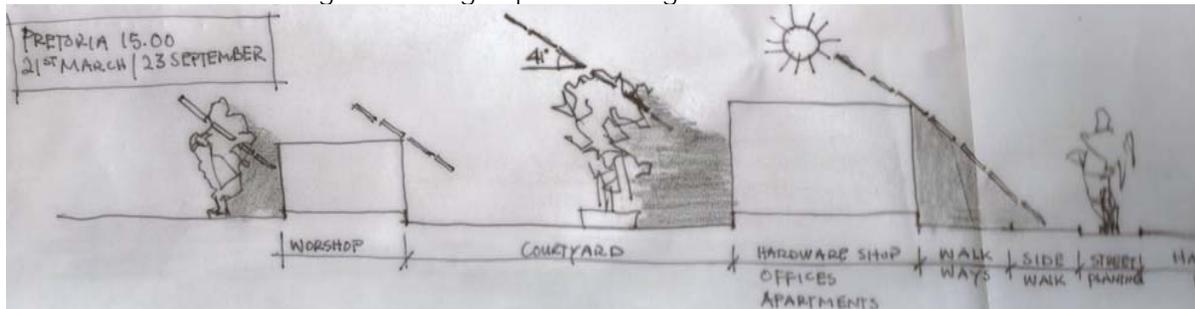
Conceptual West – East SECTION through the Centre. All walkways are shaded. The need for screen on the building from sun, wind and rain.
